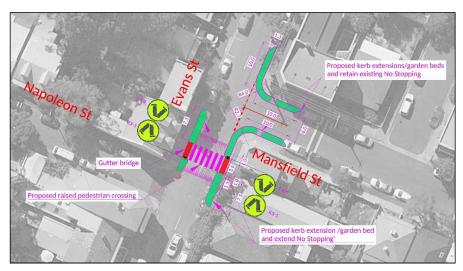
Evans Street / Mansfield Street intersection proposal.
